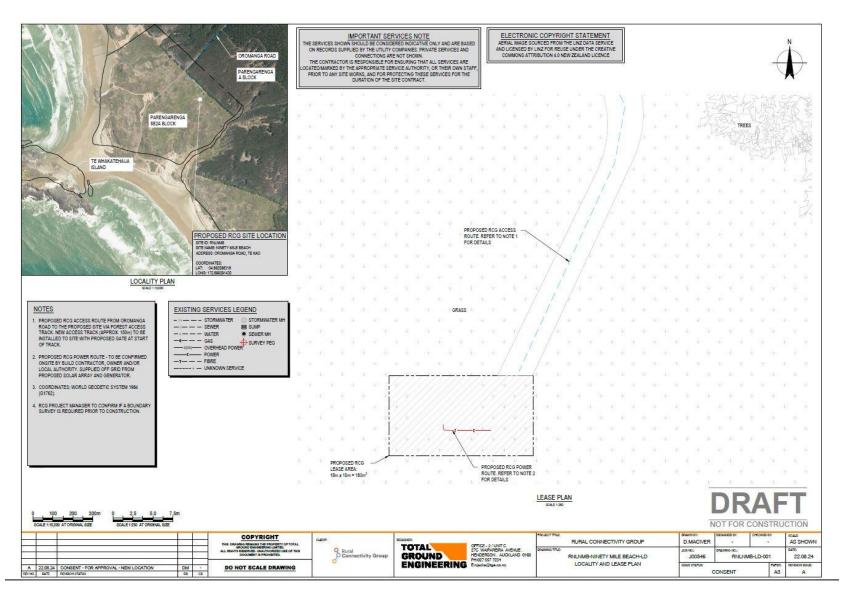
Plans issued for construction, dated 22/8/2024. Source: client.
